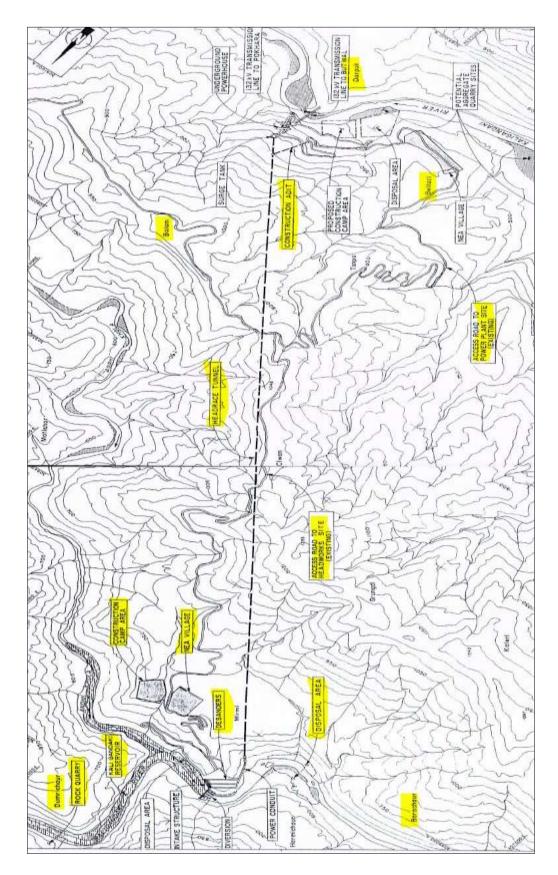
Topo Sheet showing the major structures of KG'A" Hydro Plant in Plan.
